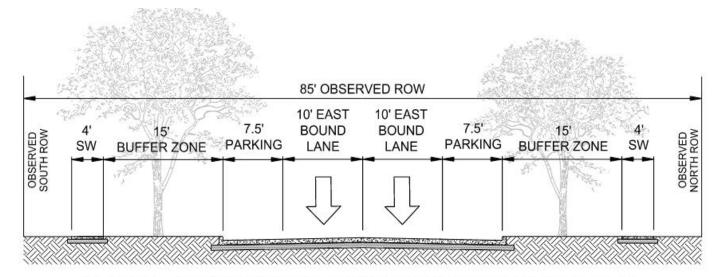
Proposed Layout for Webster Street Safety Improvements Project
